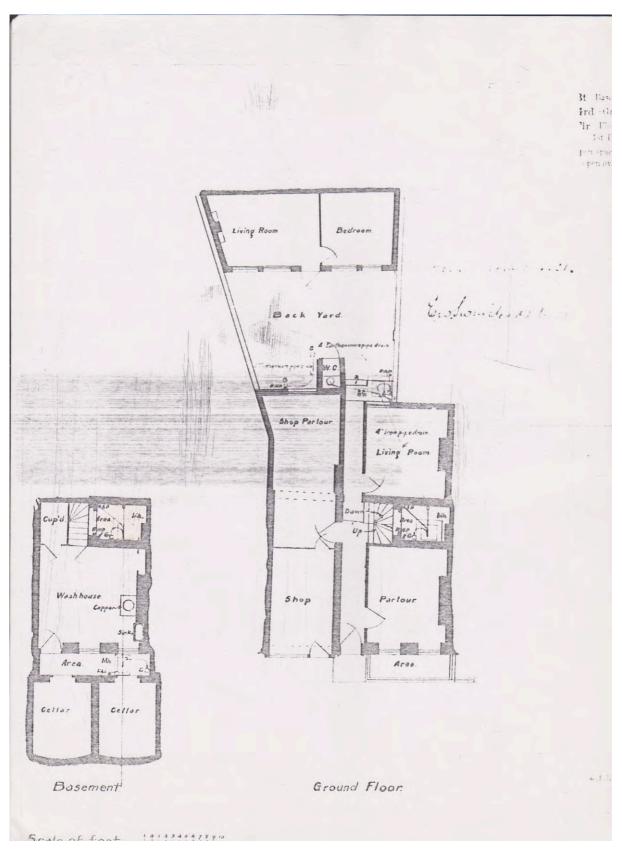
Ground floor plan of 63-65 Swinton Street in 1931 (Camden Archives, drainage records)
